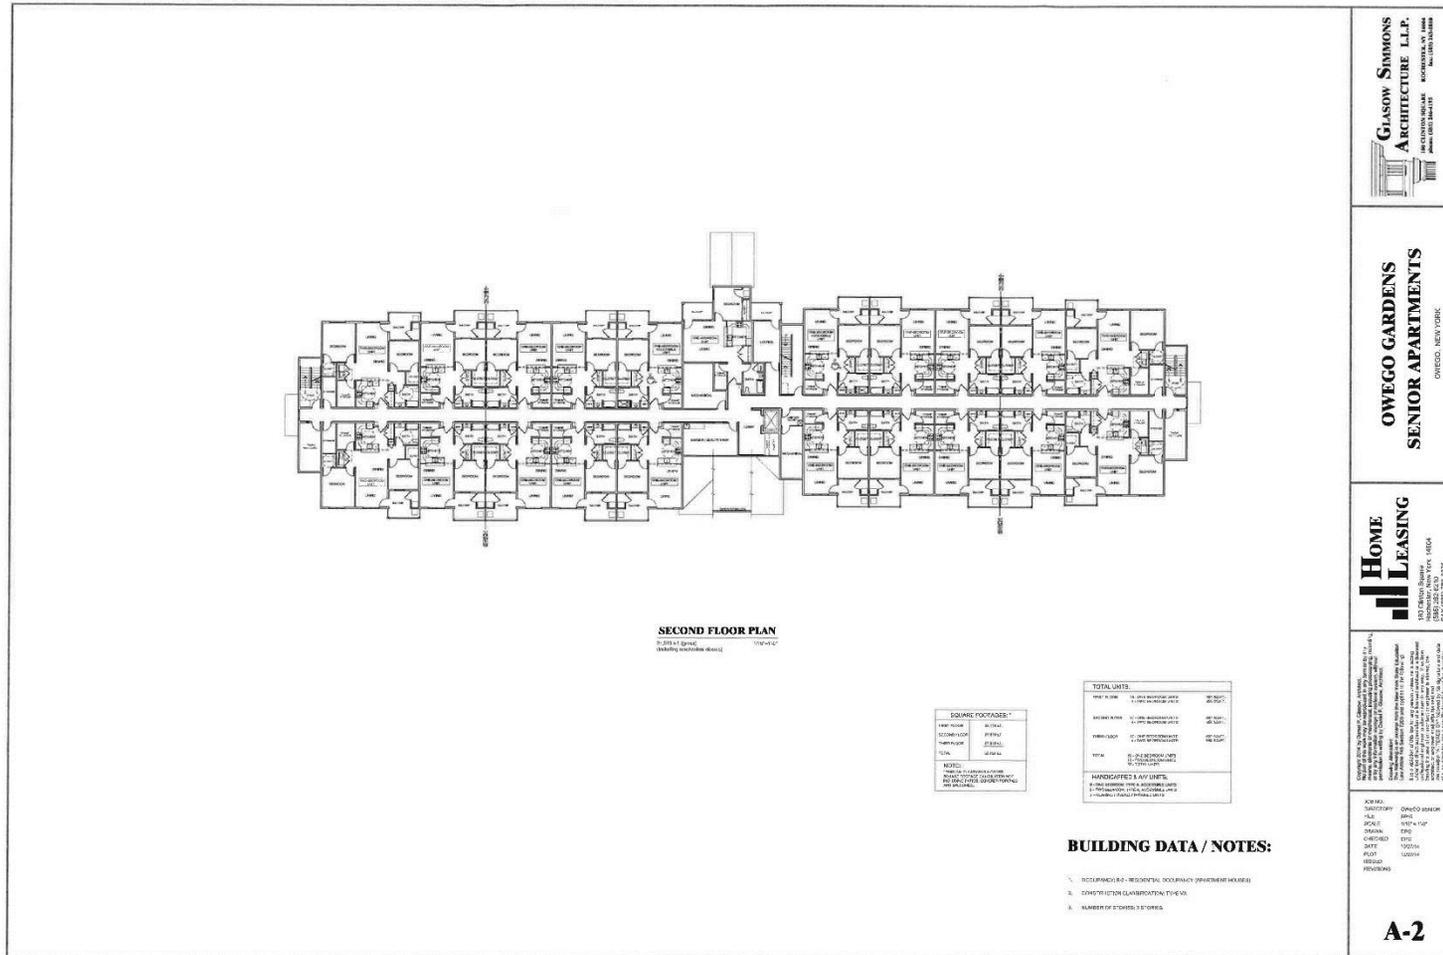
Second Floor Plan of Proposed Owego Gardens Project.
